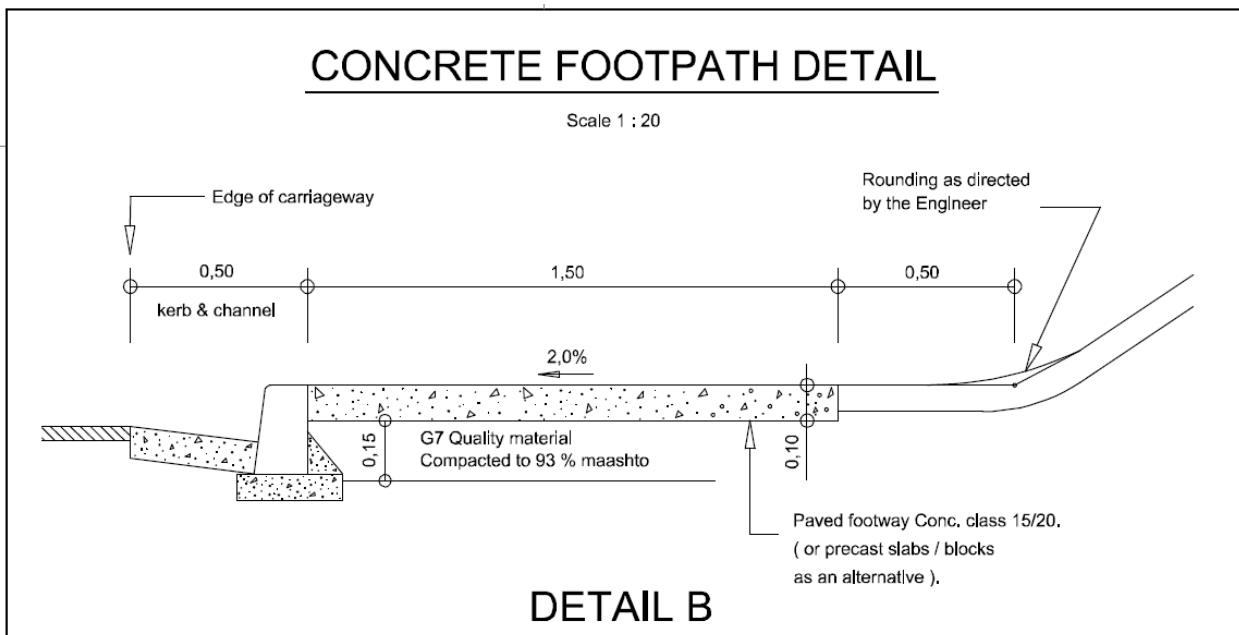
Concrete Footpath Detail (Refer to Appendix B1 for the full design drawing)
